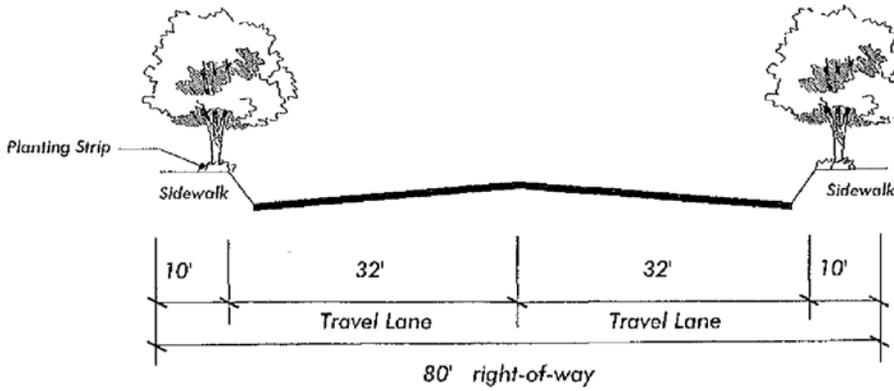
L: CITY OF Baldwin Park General Plan Roadway Cross-Sections
